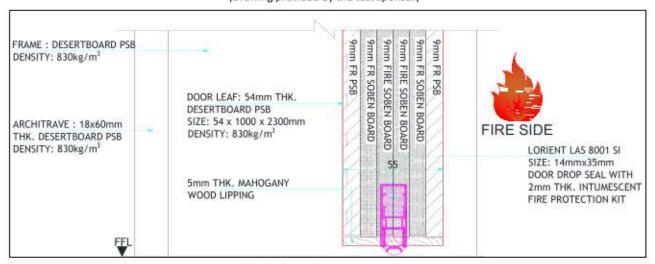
Vertical section view of the doorset A. (Drawing provided by the test sponsor)
